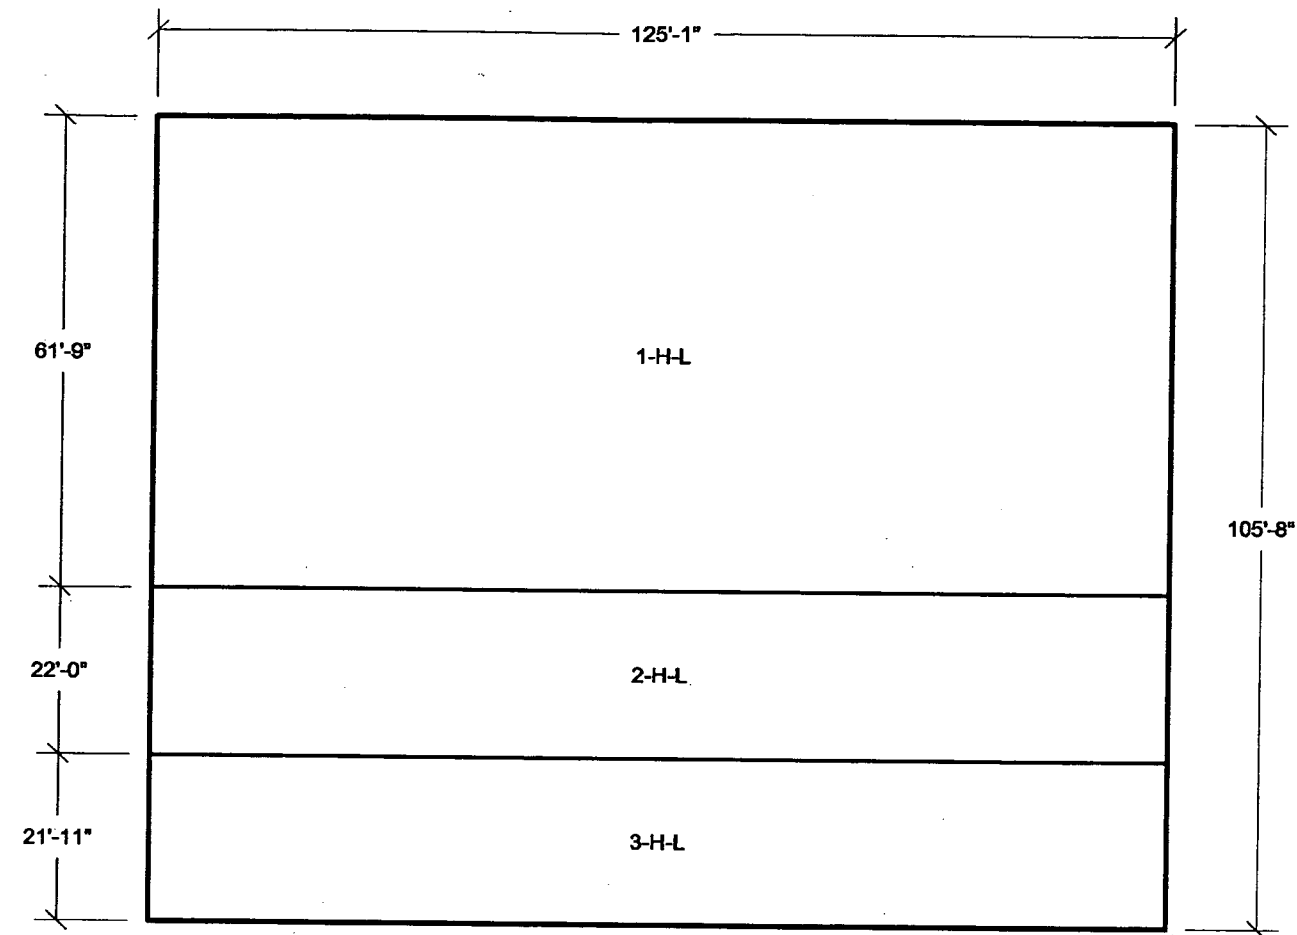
H.3-16: SOUTH WALL LOOKING NORTH
